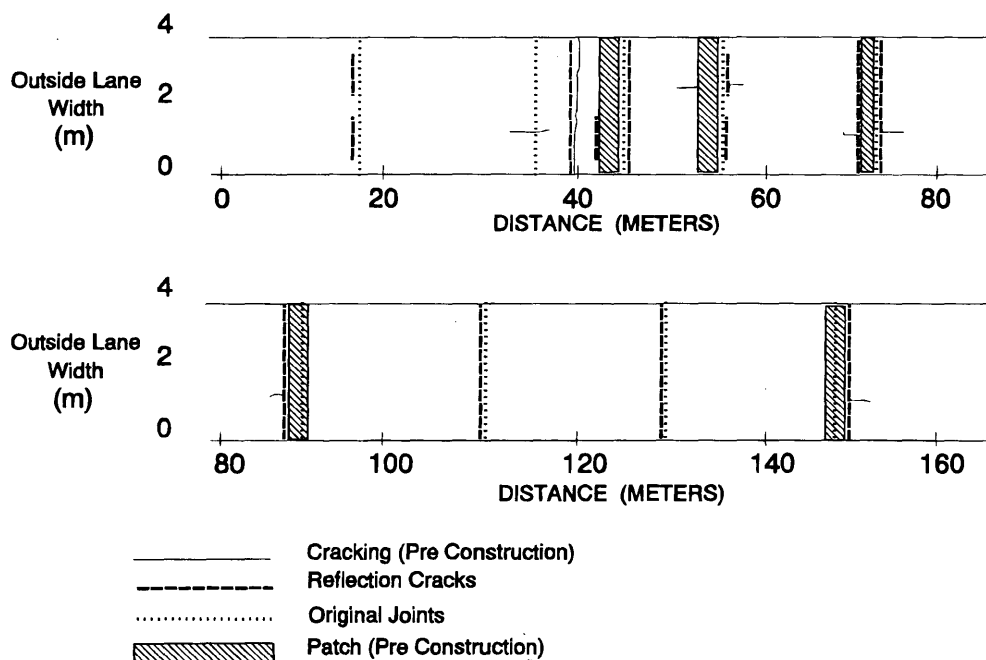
Distress summary for test section 400606 [0.1 m (4 in.) overlay with drain].
